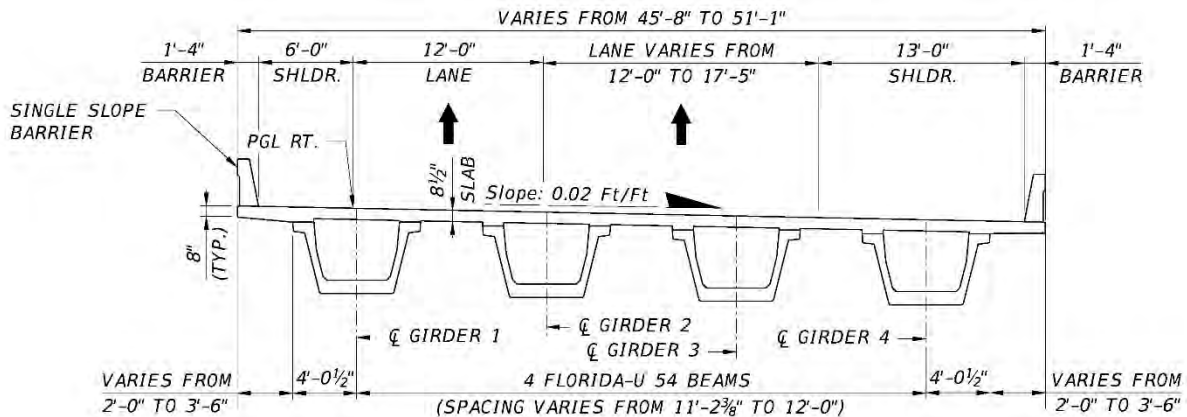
Bridge #17 Typical Section (Spans 1 & 2)
